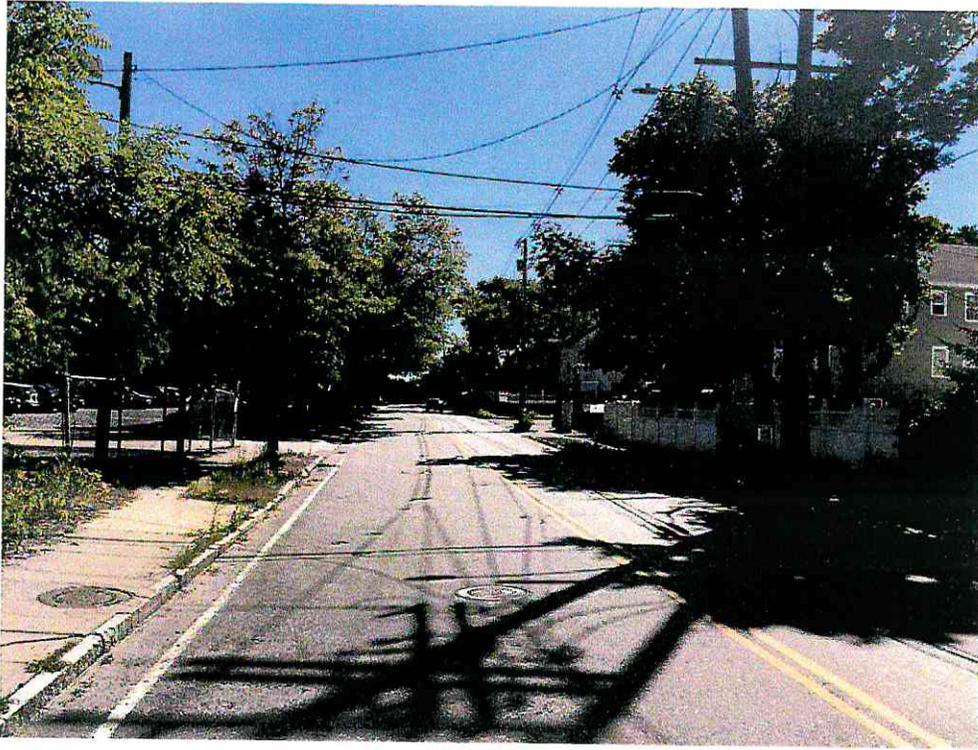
Location a - Cross St. looking east. 85' west of Wendell St.
